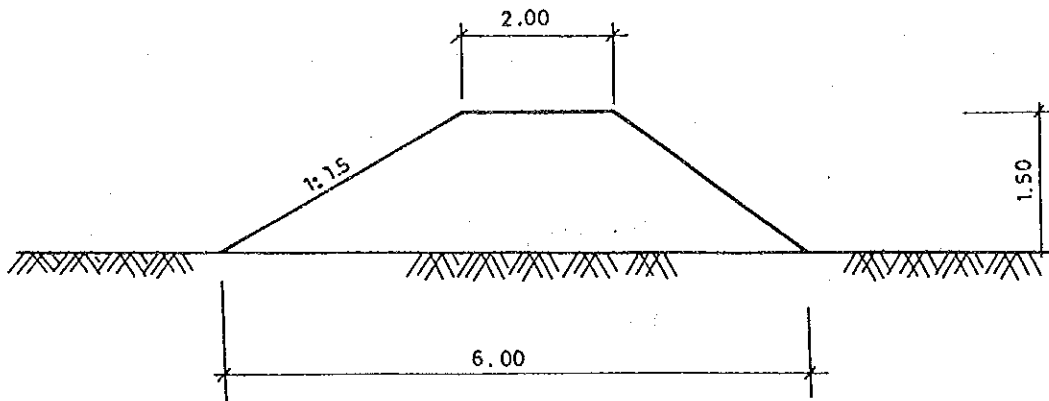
Typical Cross Section of Divider Drainage System
